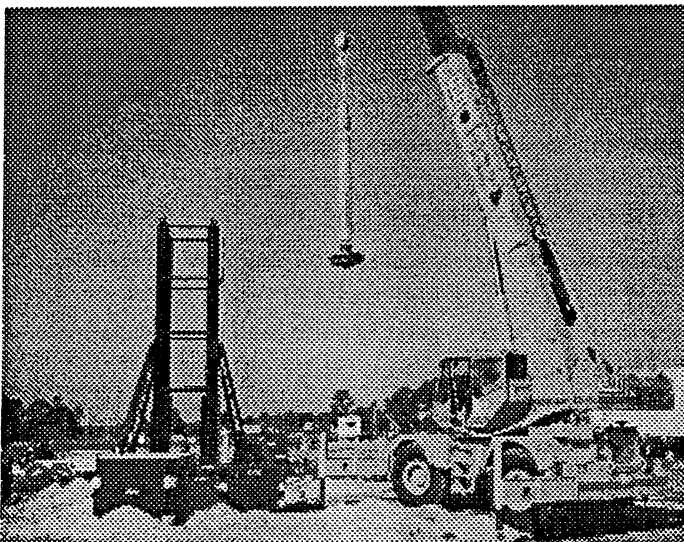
Install silencer. *NOTE: fuel basket can be installed after assembly is complete.
